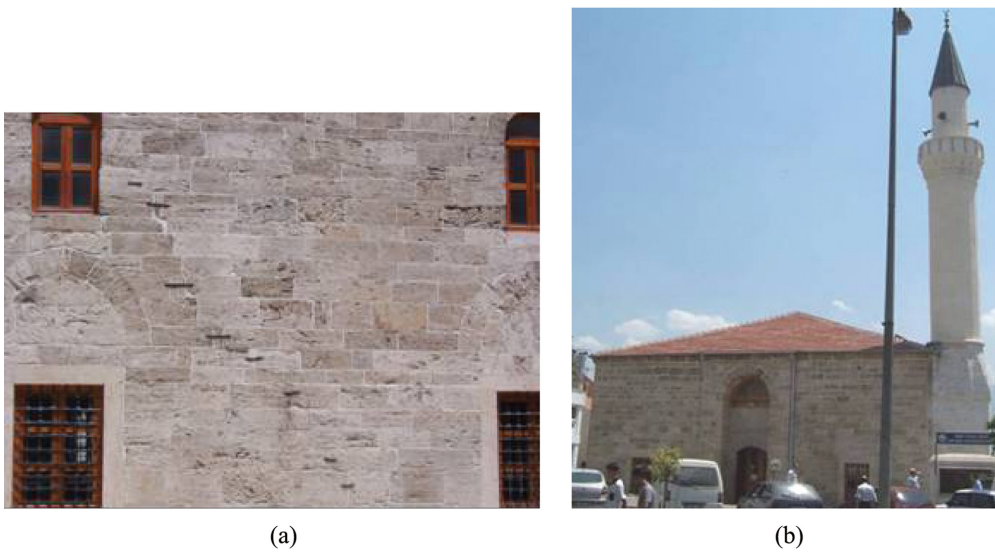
(a) Repaired wall and (b) recently constructed minaret
